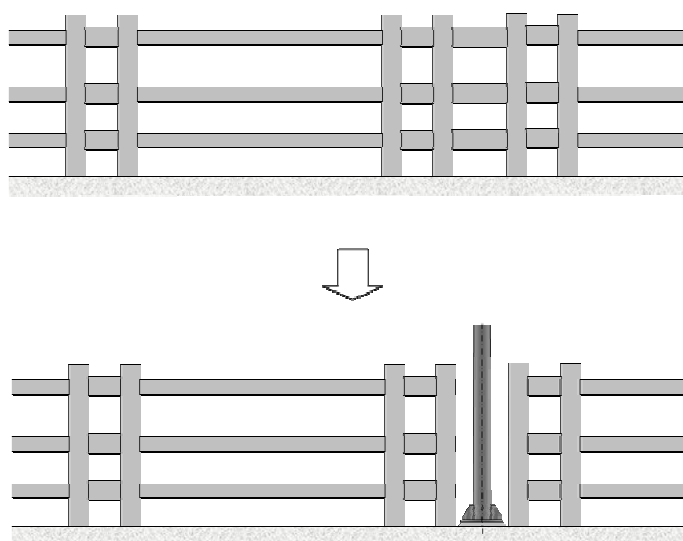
Installation Plan for Road Lighting Poles between Handrails
